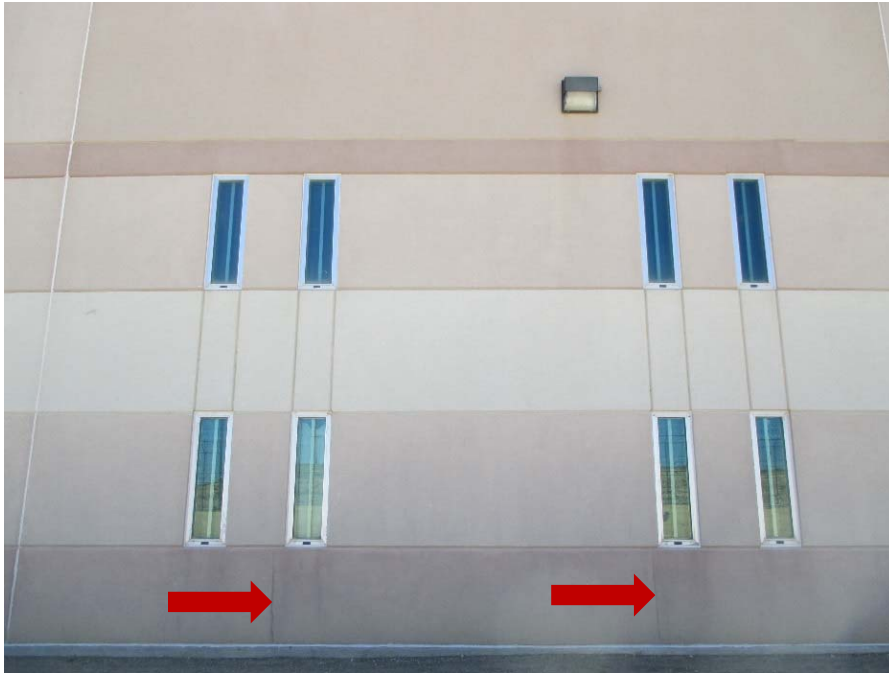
B. Distressed masonry beneath steel beam bearing near new column in Corridor F127.
